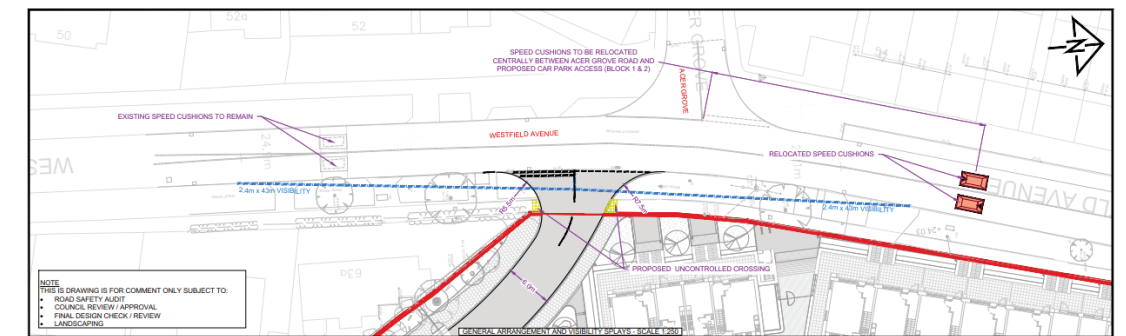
Proposed Access Junction – Blocks 1 and 2
